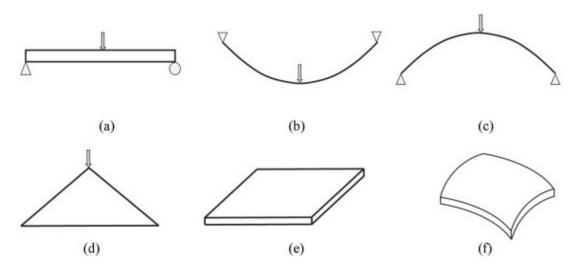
Component structural forms: (a) beam; (b) cable; (c) arch; (d) truss; (e) plate; (f) shell
